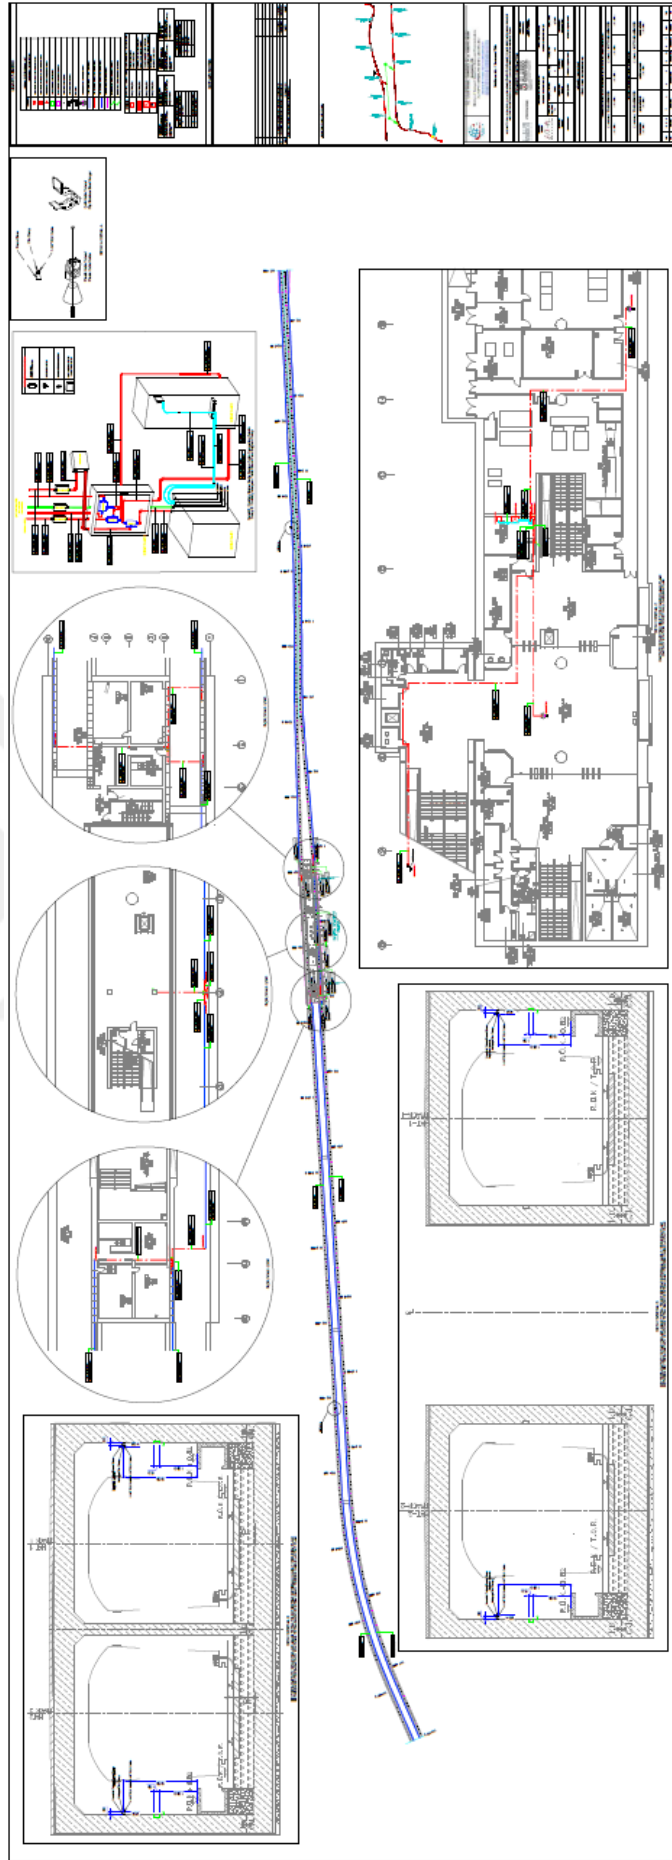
Architectural sketch of Umitkoy metro station platform floor
